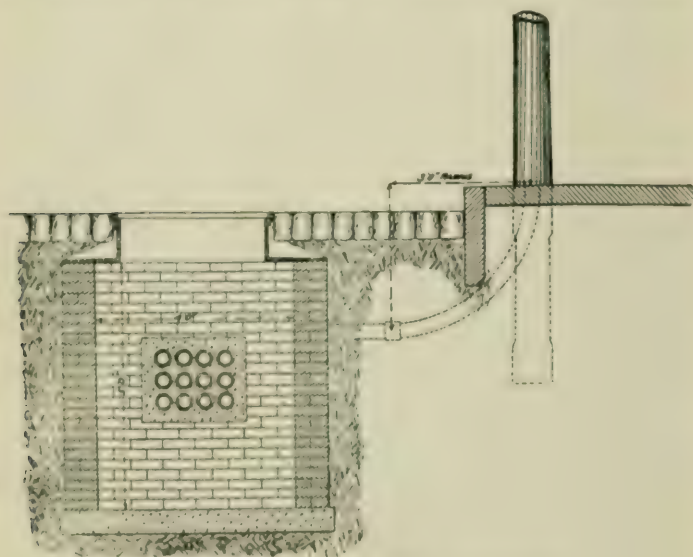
MANHOLE WITH LATERAL CONNECTION.
